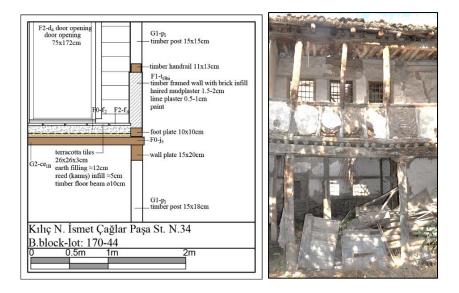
Connection detail 5, section drawing of floor beams located on the wall plate of lower timber post and foot plate of located on floor beams (Kılıç N. b.block-lot: 170-44)
